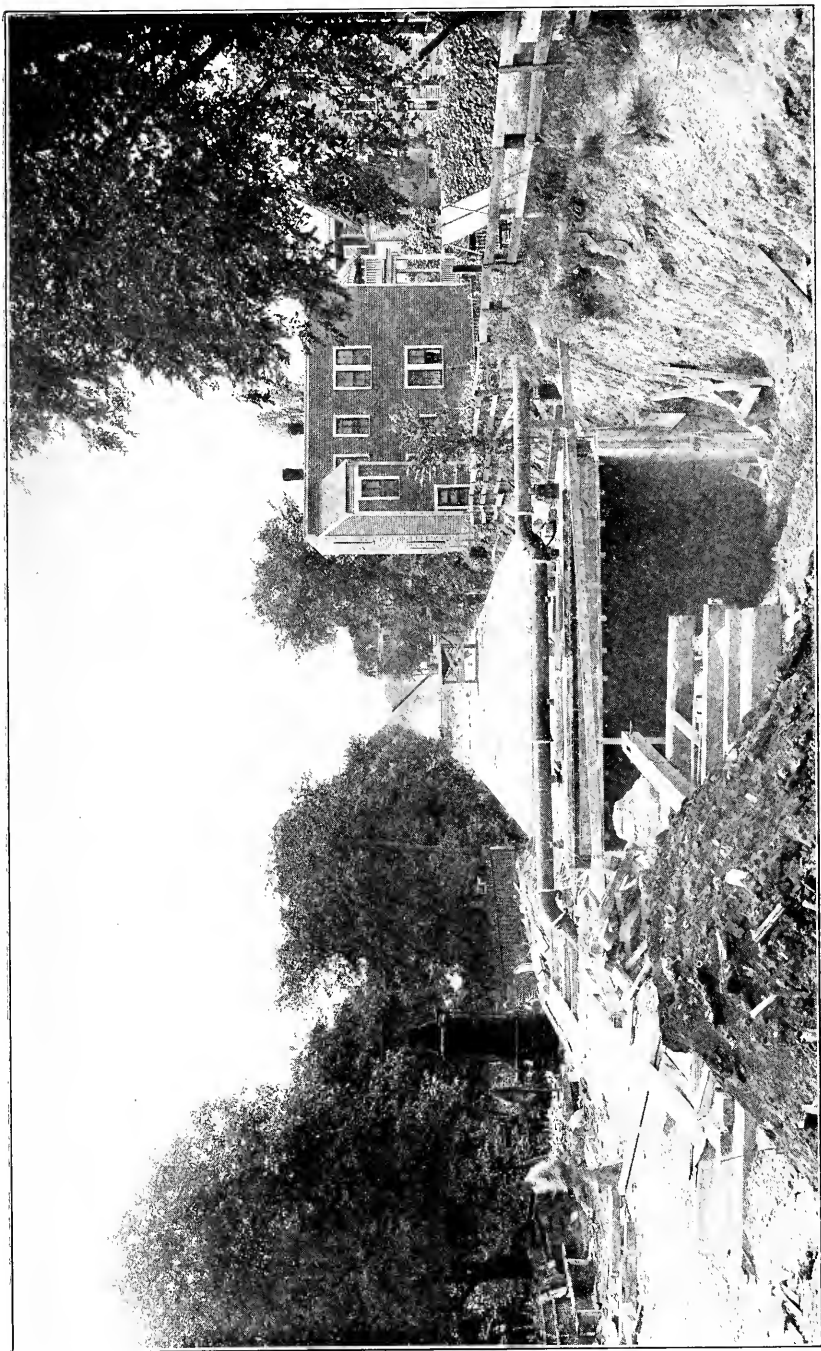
PLATE XII.—GENERAL VIEW ALONG ROOF OF COVERED SECTION.
